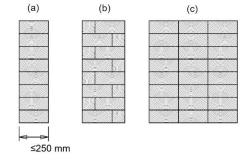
Cross-sectional layouts of glue laminated timber. Widths up to 250 mm can be achieved using one laminate per layer (a). Typical layout arrangements for widths > 250 mm are shown in (b) and (c).
